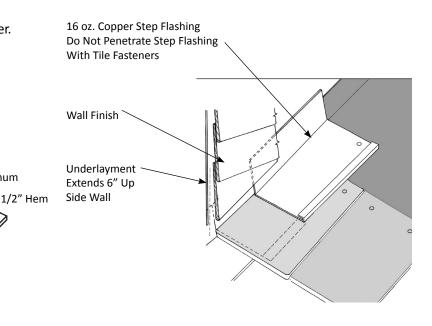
Side Wall Copper Step Flashing With Counter Flashing
